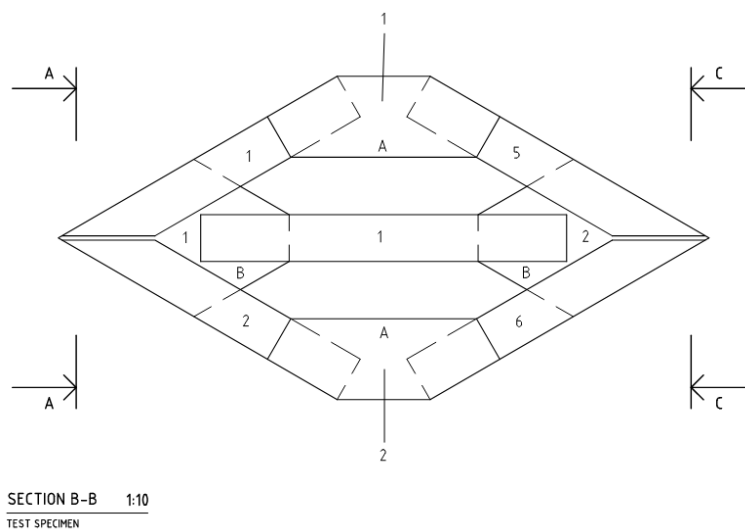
Littera numbering for specimen parts, see drawing K-20-2-1003, Appendix D
